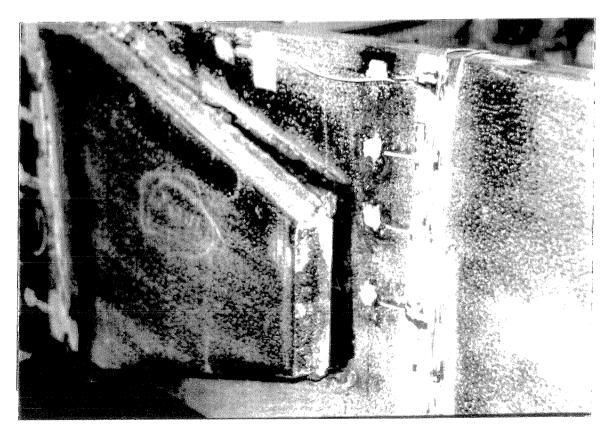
BENDING OF BEAM BOTTOM FLANGE (@ 6" DISPLACEMENT)
